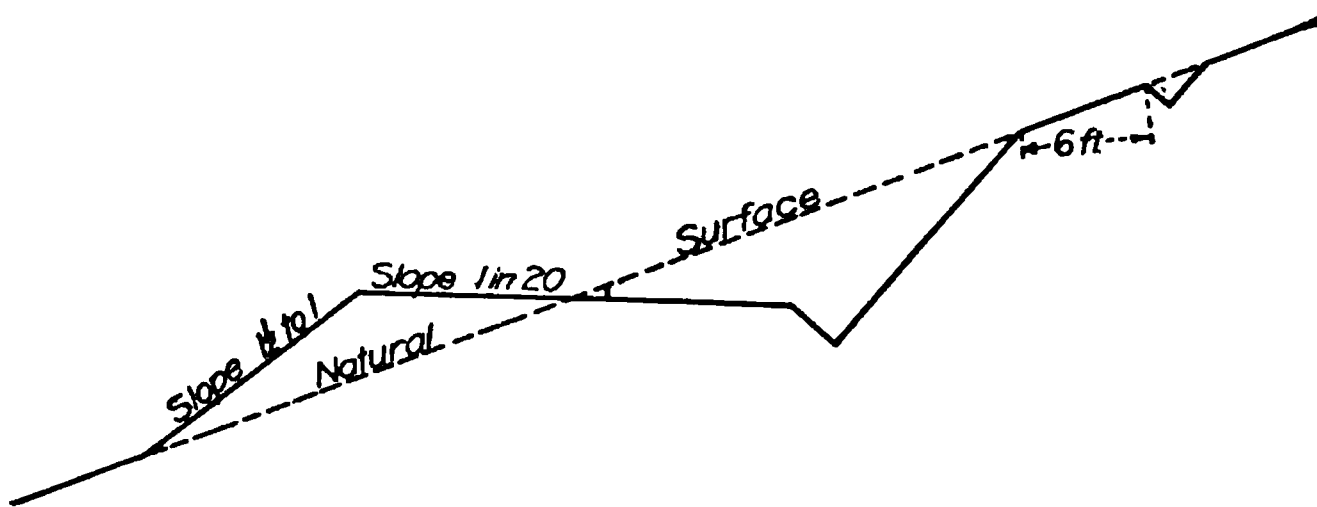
CROSS SECTION OF ROAD ON SIDE HILL.
